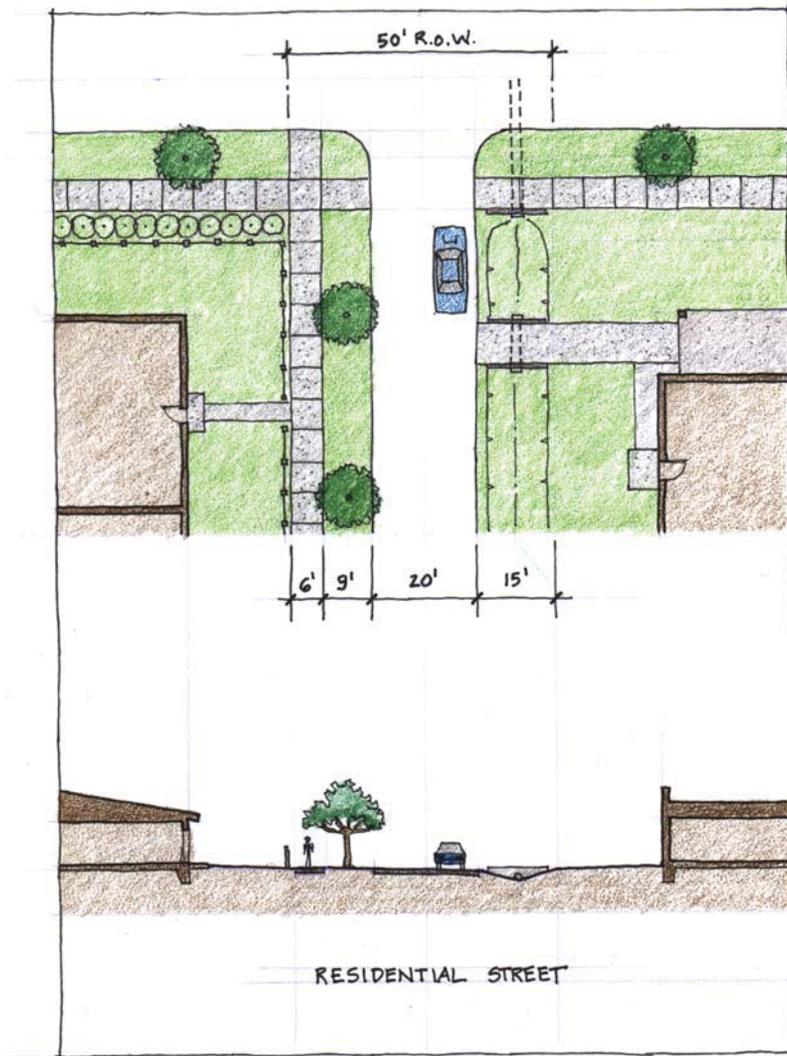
Plan and Section of a Typical Neighborhood Street
